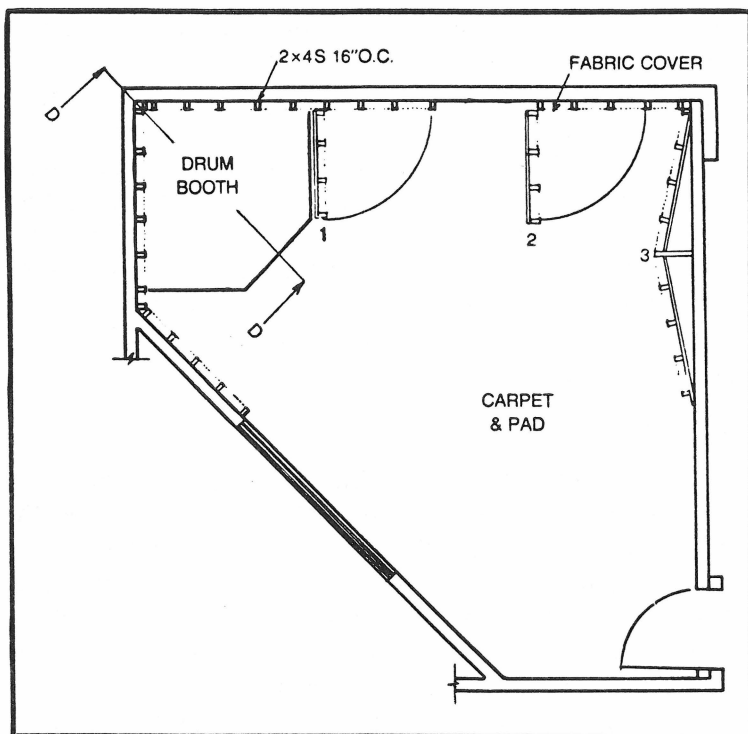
Studio details in garage converted to multitrack studio. Swinging doors 1 and 2 serve as baffles between instruments. Element 3 on east wall helps to absorb very low frequencies.
